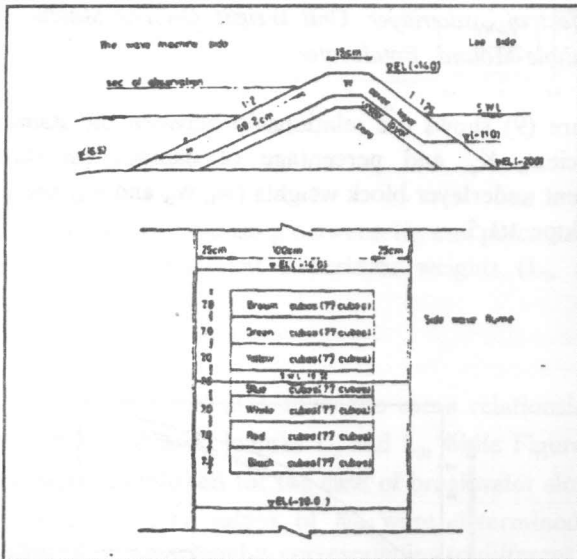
Cross section of the breakwater model and details of the observation area (for slope 1:2).
